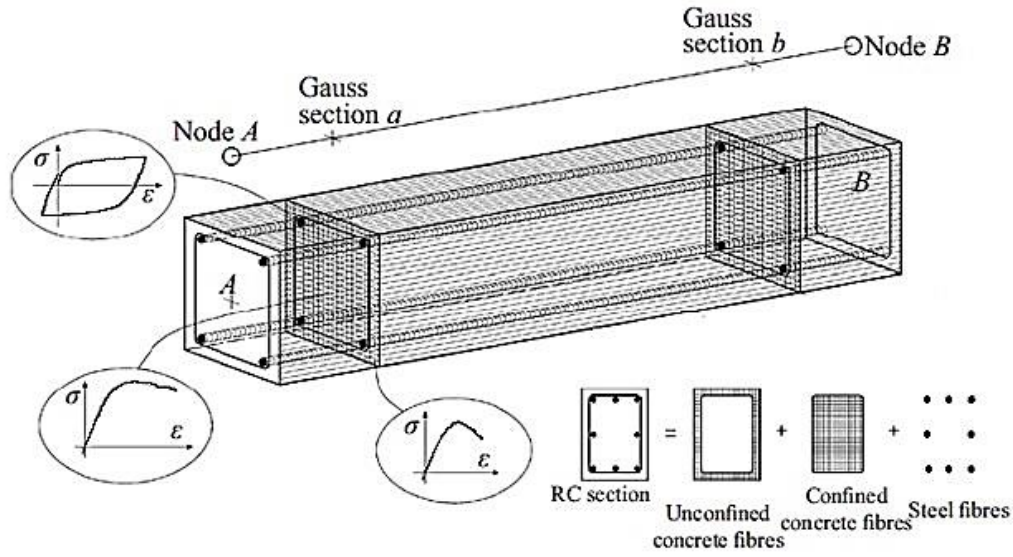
Fiber beam-column element, discretization of the typical concrete cross-section (24)
